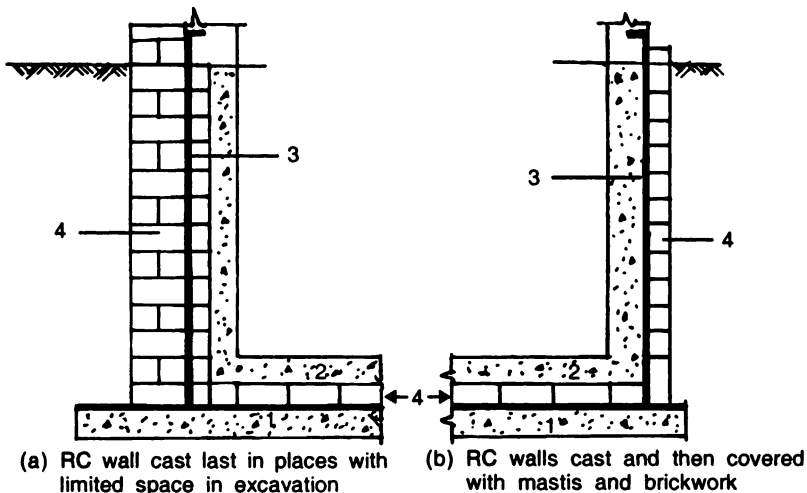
Tanking (water proofing) of basements: 1. Lean cement concrete, 2. Floor slab, 3. Dampproofing, (in black colour), 4. Brickwork.
